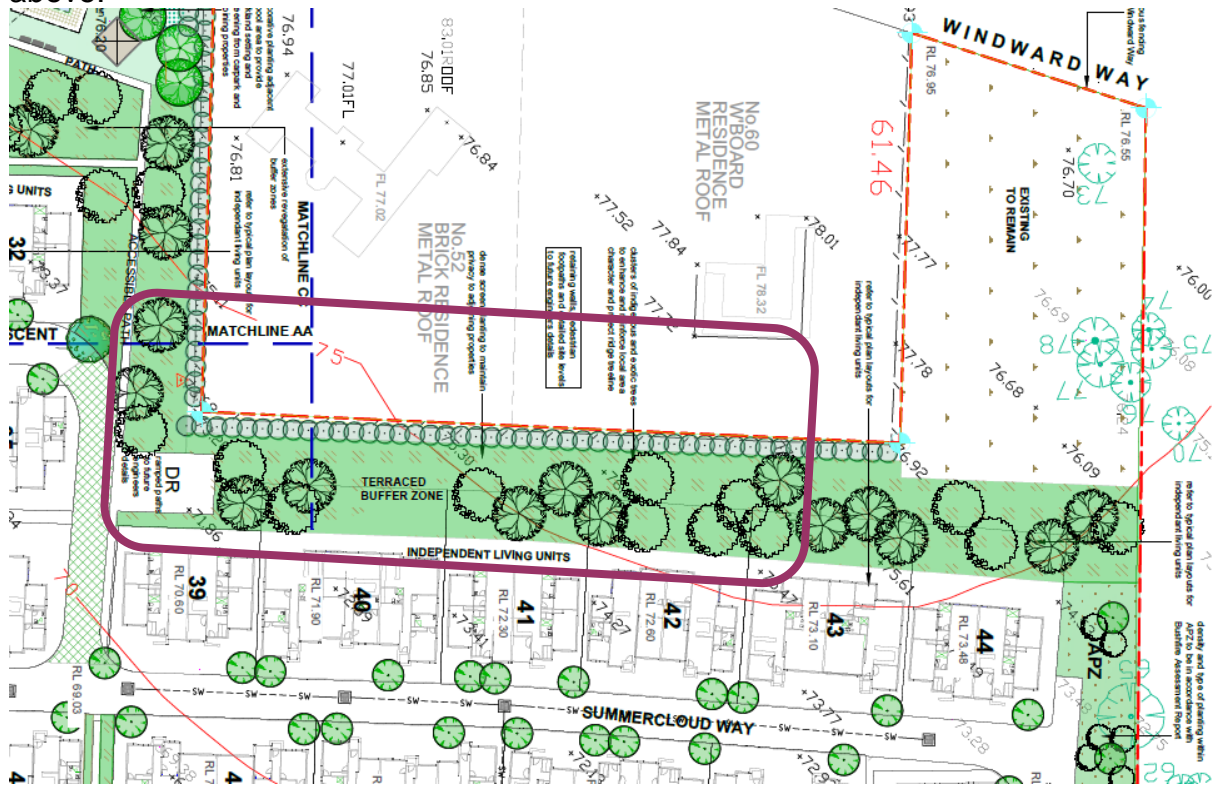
Extract of Landscape Plan detailing proposed landscaping north of 52 & 60 Winward Way
